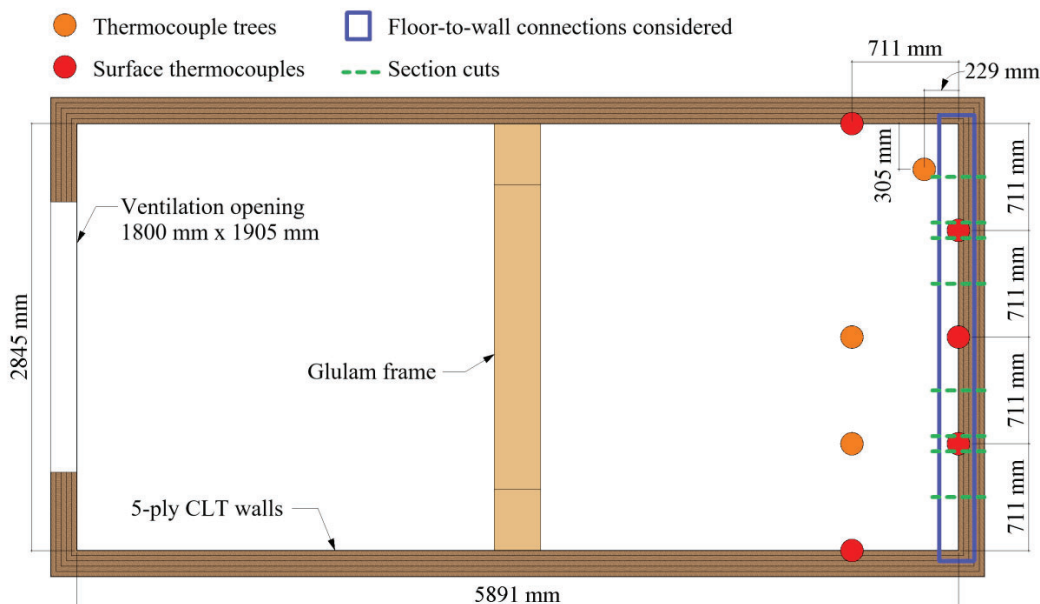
Plan view of typical large-scale compartment. Not all sensors shown for clarity.
